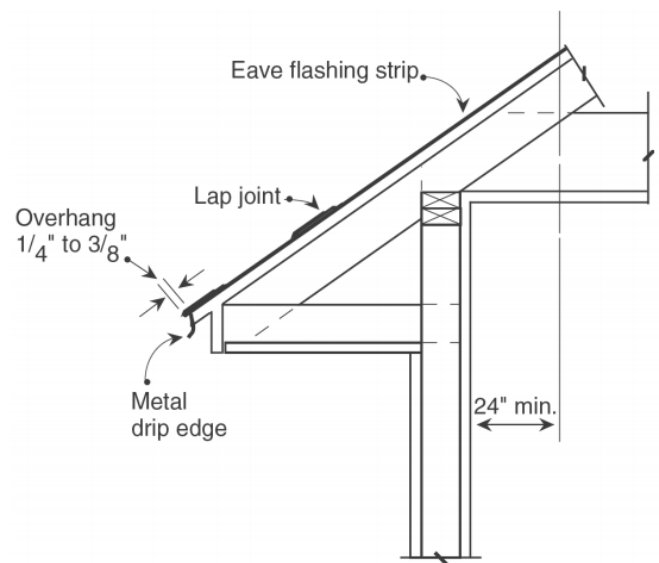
Figure B: Eaves flashing for normal slope using asphalt saturated felt
